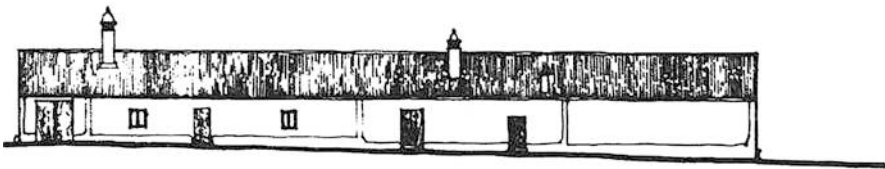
Monte da Boleja front elevation (credit: AAP 1961)
